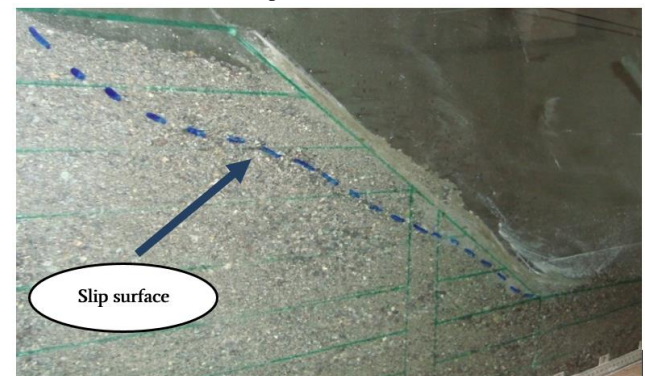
Failure of the reinforced slope using a rigid stone column under a pressure of 8.52 kPa.
